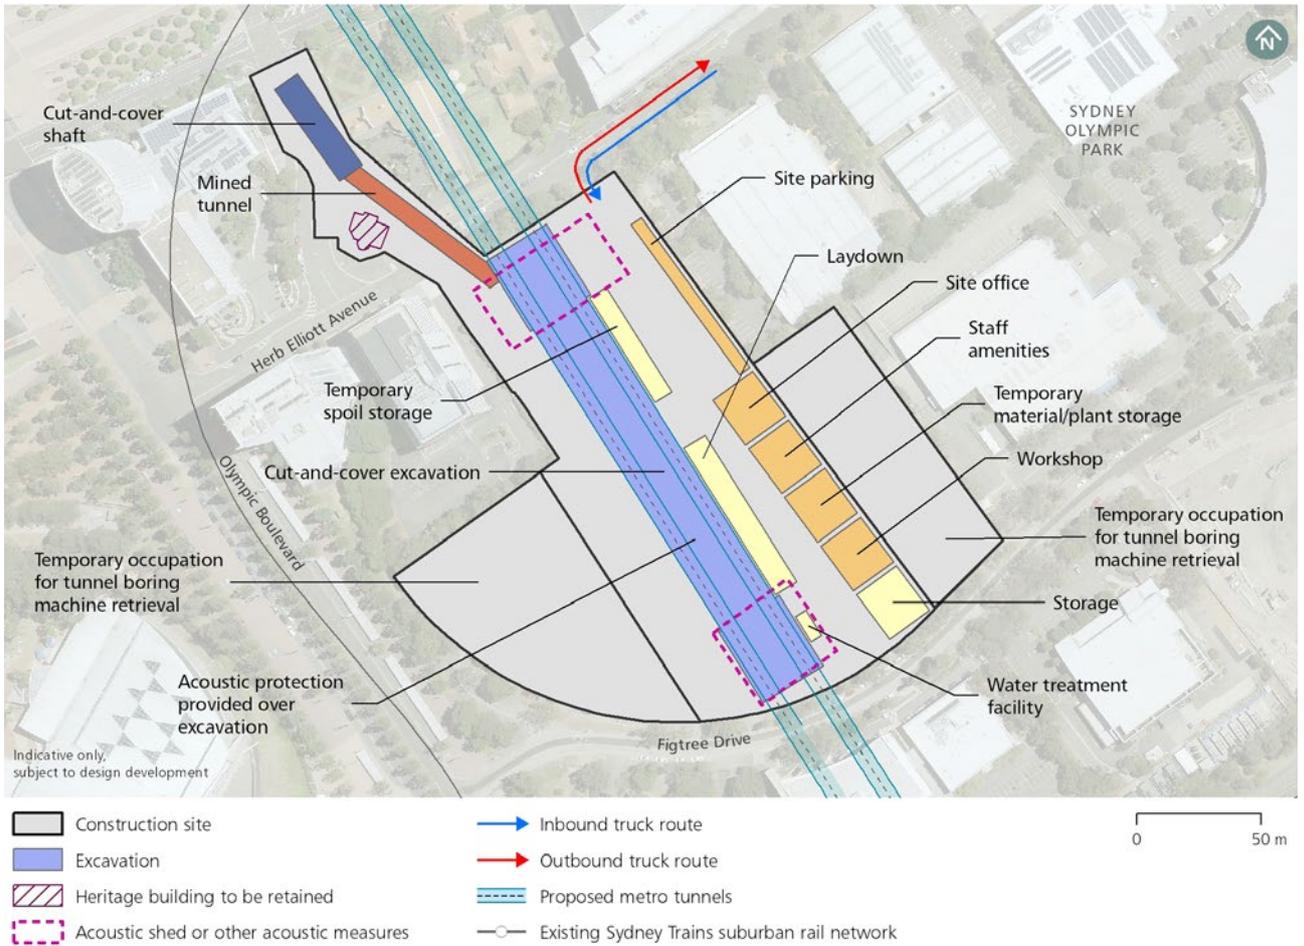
Amended Sydney Olympic Park metro station indicative construction site layout
